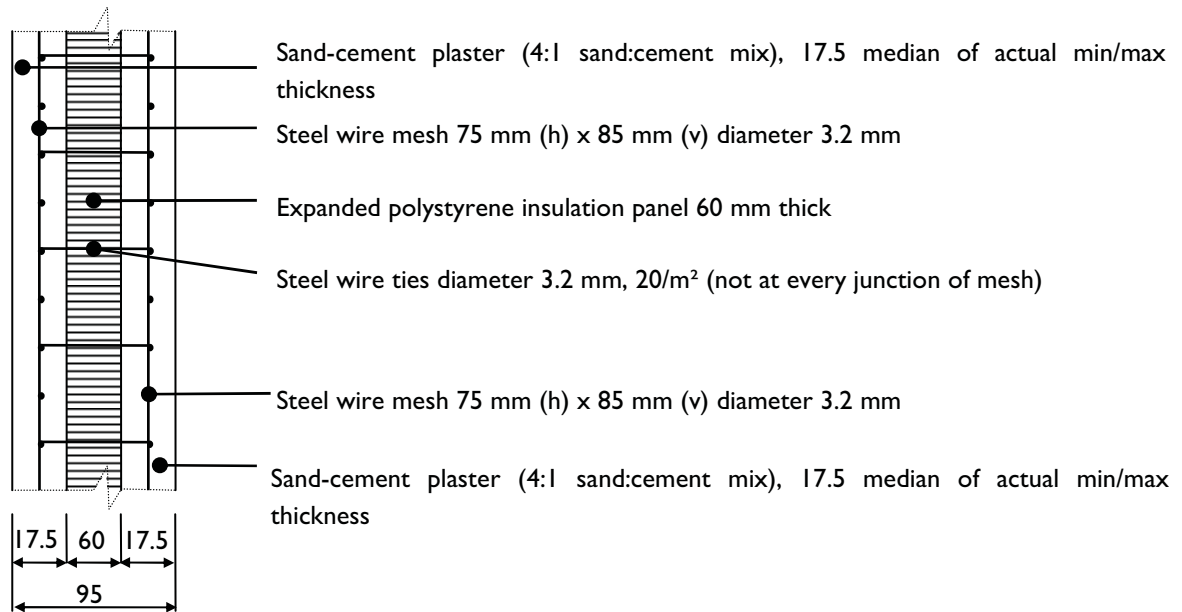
Ikhaya Futurehouse System (IFHS) typical external wall section, as modelled, based on information from the manufacturer
